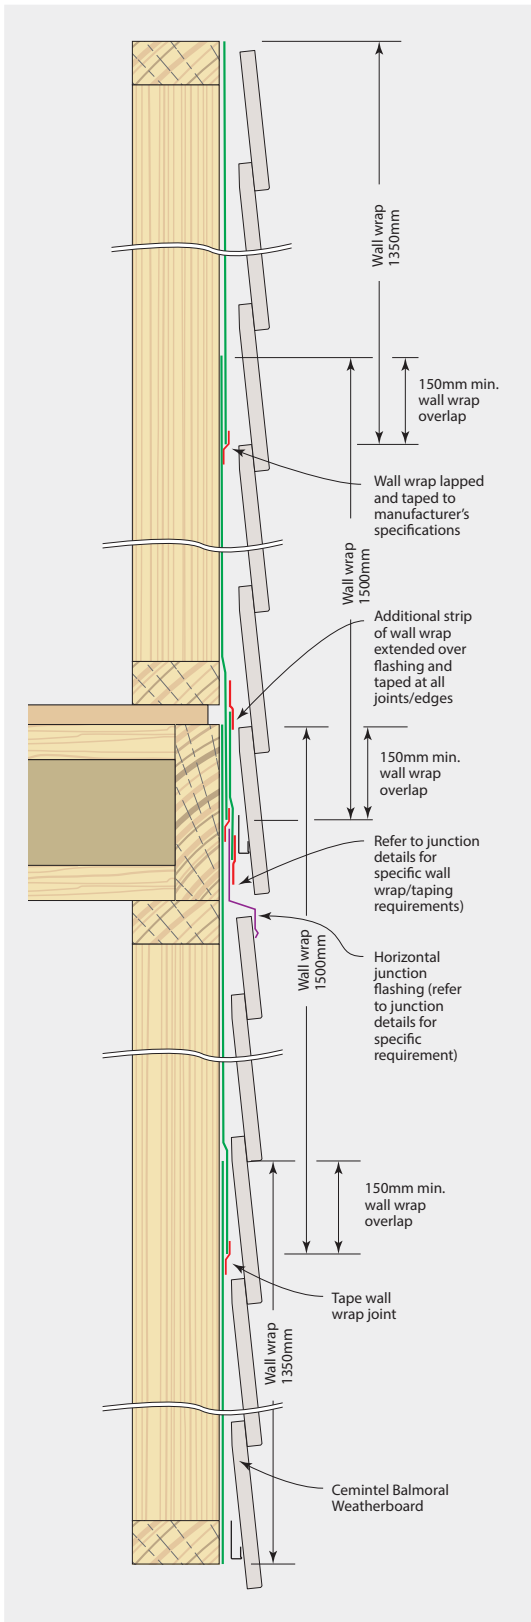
Typical Wall Wrap Layout for Two-Storey FramingFIGURE 7.13 Typical Double Layer Wall Wrap Over Openings – Direct Fix System
